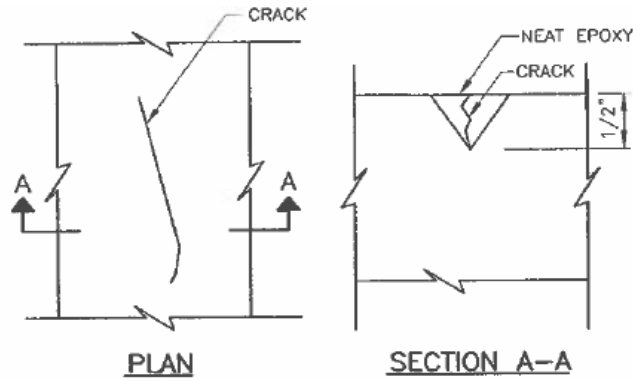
Repair of concrete cracks (Seniwongse 2007).
